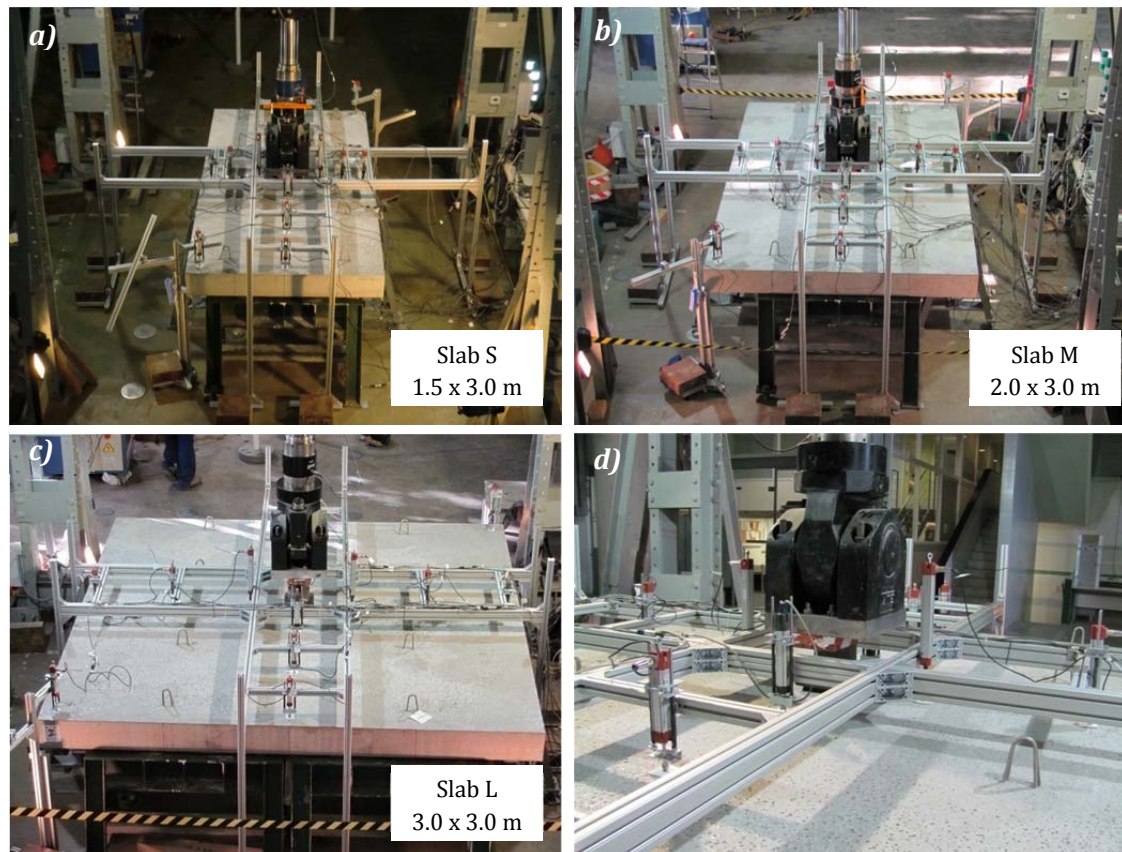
Setup for slab a) S, b) M, c) L and d) detail of the loading point.
